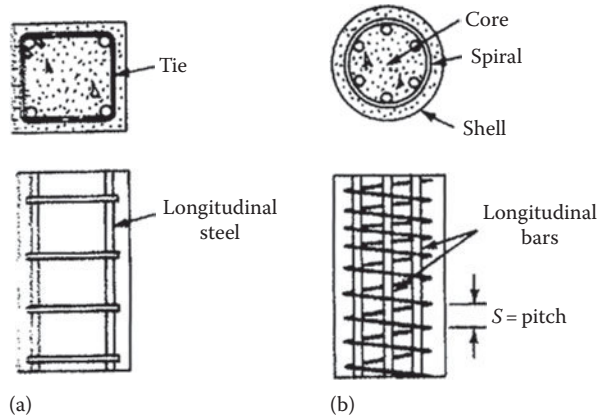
Ties of columns: (a) Tied column, minimum of four longitudinal bars required in a rectangular column. (b) Spiral column, minimum of six longitudinal bars required.
